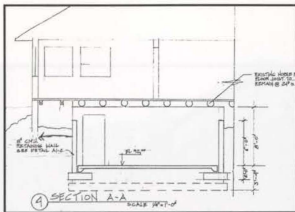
Section from basement wood storage area construction drawings. Image from George Engineering Inc.
